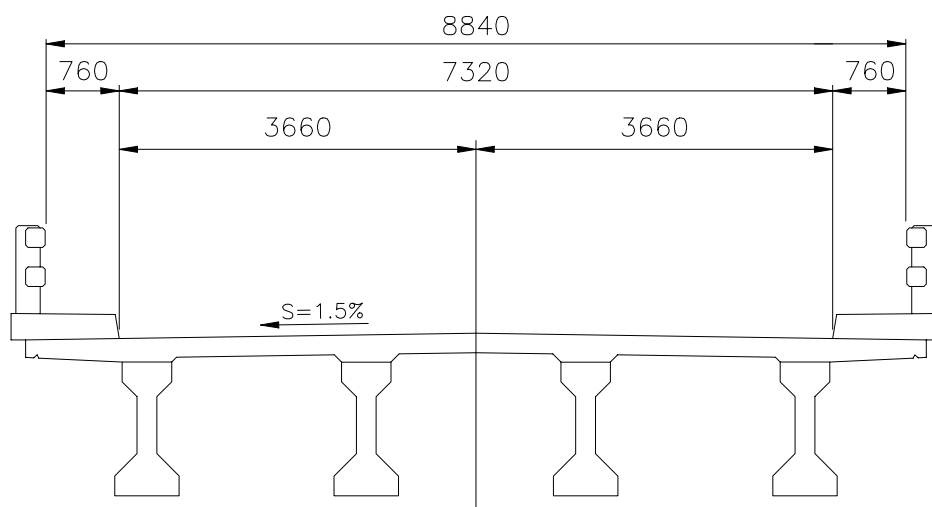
BRIDGE WIDTH
